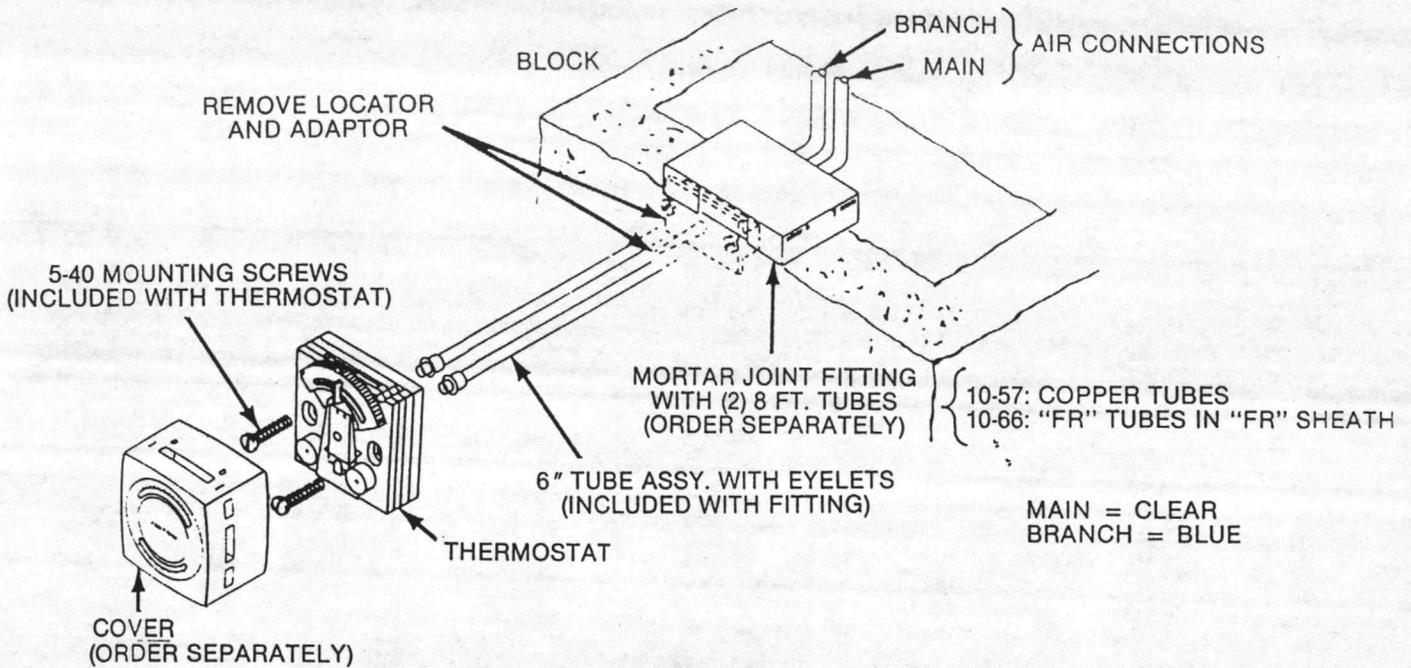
MORTAR JOINT FITTING IN MASONRY WALL (TYPICAL)
